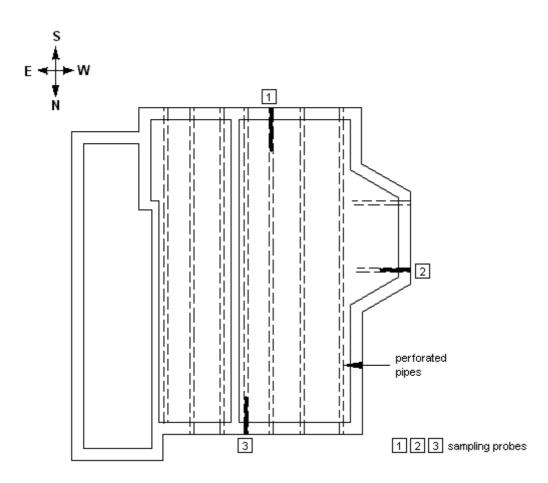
Layout of perforated pipes in the plan of foundations. Location of sampling probes used during diagnostic measurements.
